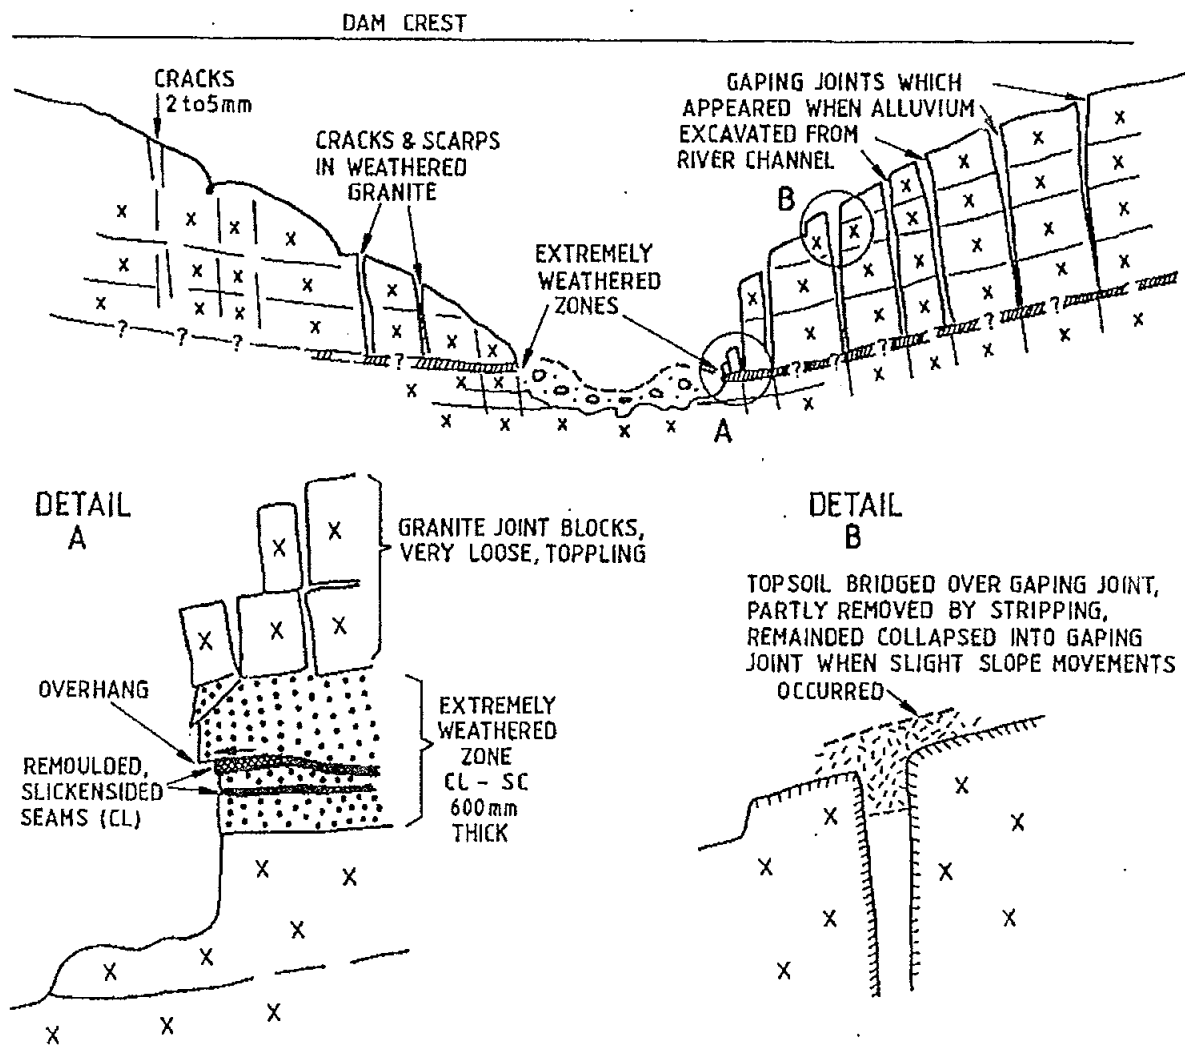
Tooma Dam, cross section and sketches through downstream shoulder.
